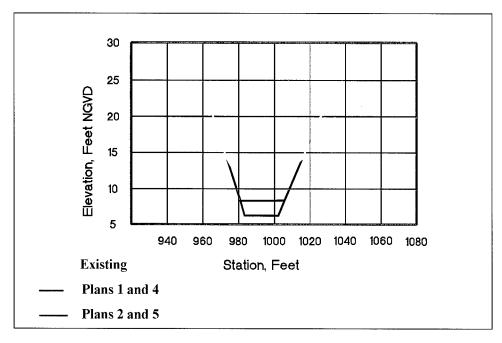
Type 1 and Type 2 downstream sediment basin cross section at Station 374+23
